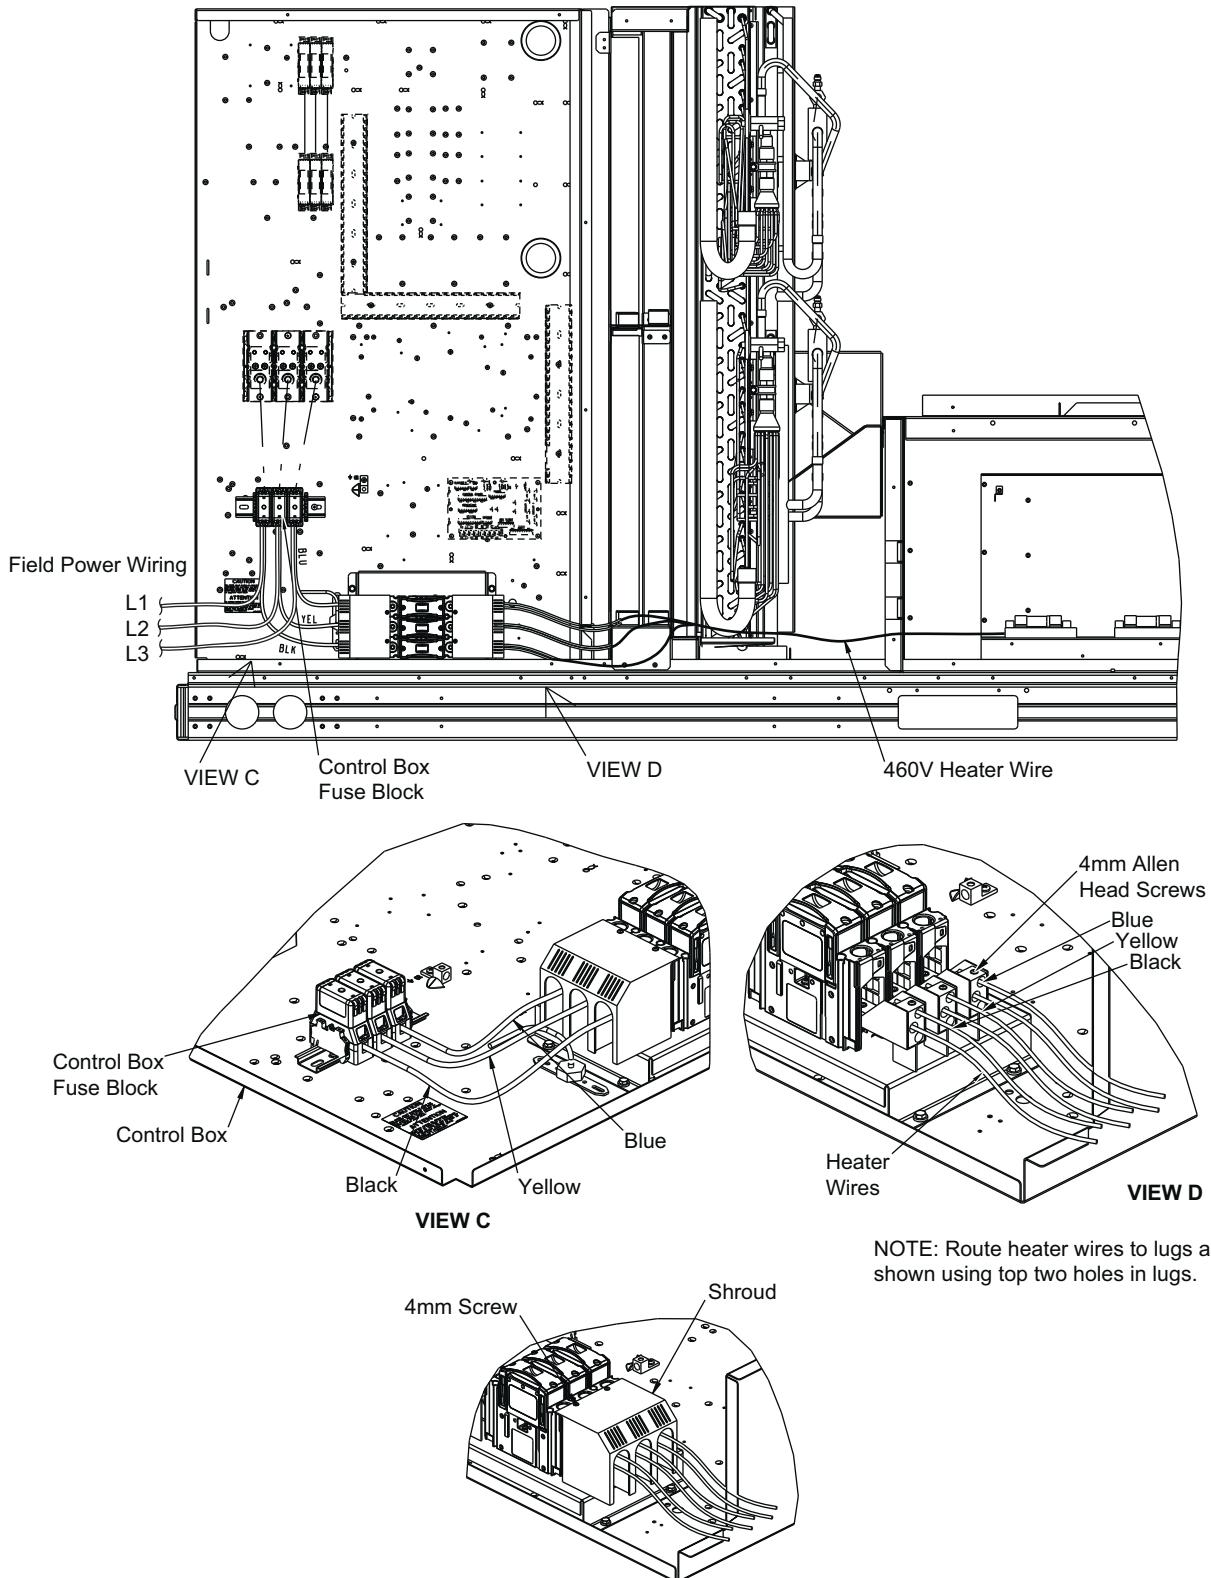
460V Single Point Power Assembly Location (High SCCR)
